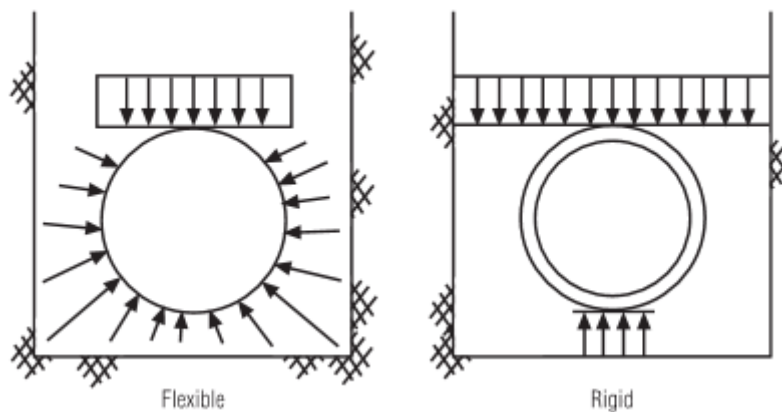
Flexible and Rigid Pipe Backfill Interaction (PPI n.d.)
